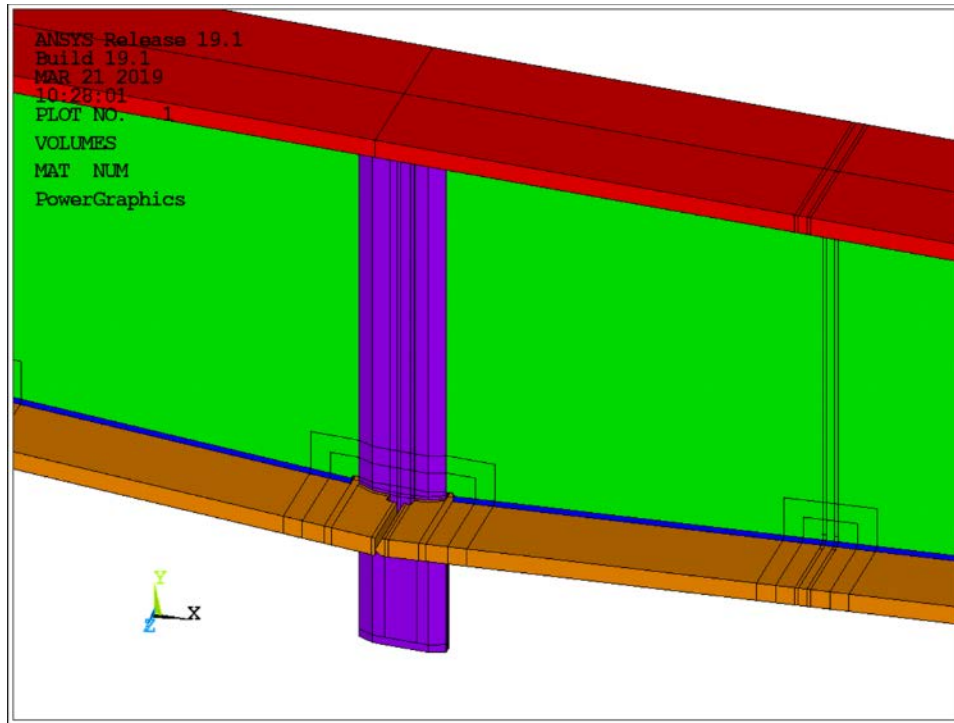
Girder solid model prior to groove welding the bottom flange plates together. Configuration is based on welding sequence provided to LPI. Note the absence of vertical stiffeners and welds between bottom flange and tapered hanger.
